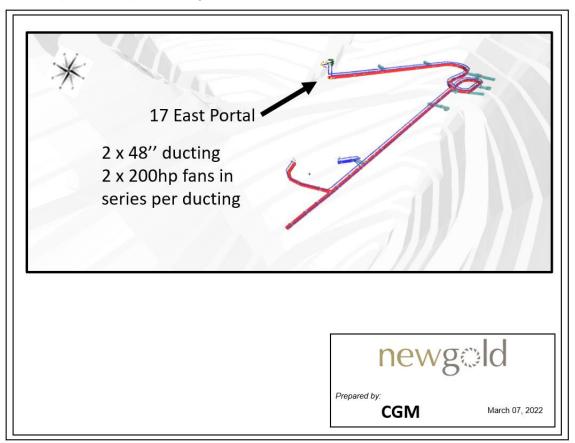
Pre-production Ventilation Arrangement towards East Ventilation Raise
